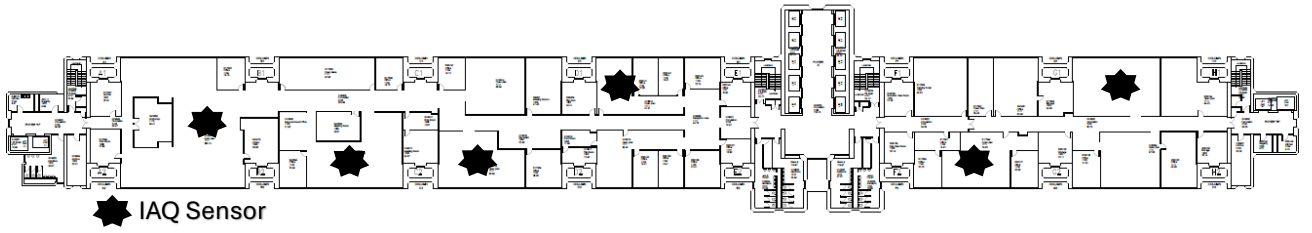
Tower Building proposed sensor positioning 16th floor (6)
